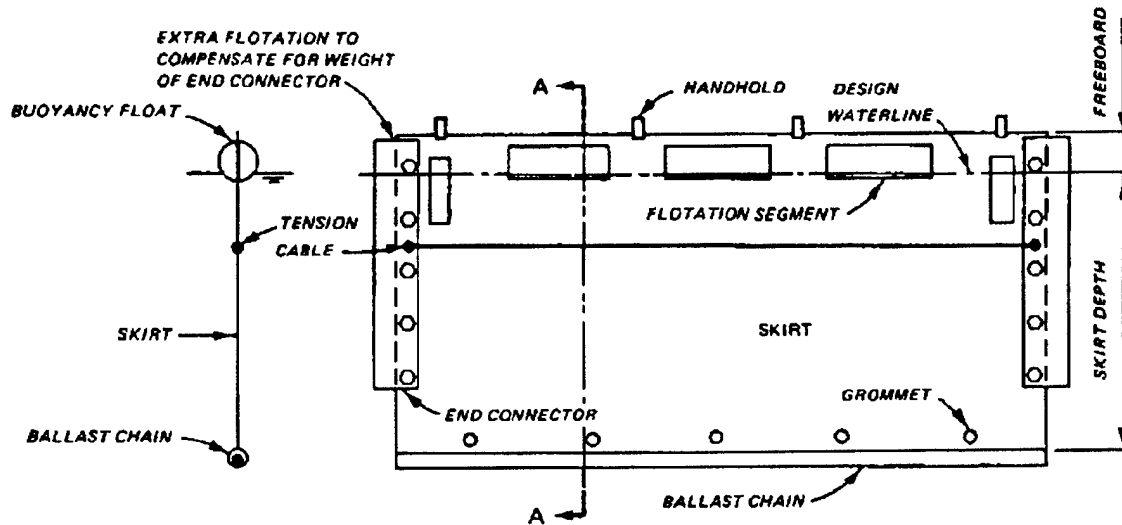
Construction of a Typical Center Tension Silt Curtain Section
